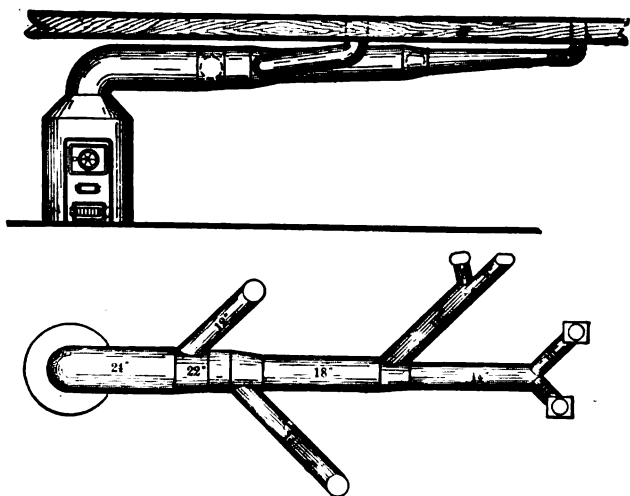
Plan and Elevation of Furnace with Main Pipe and Branches.
